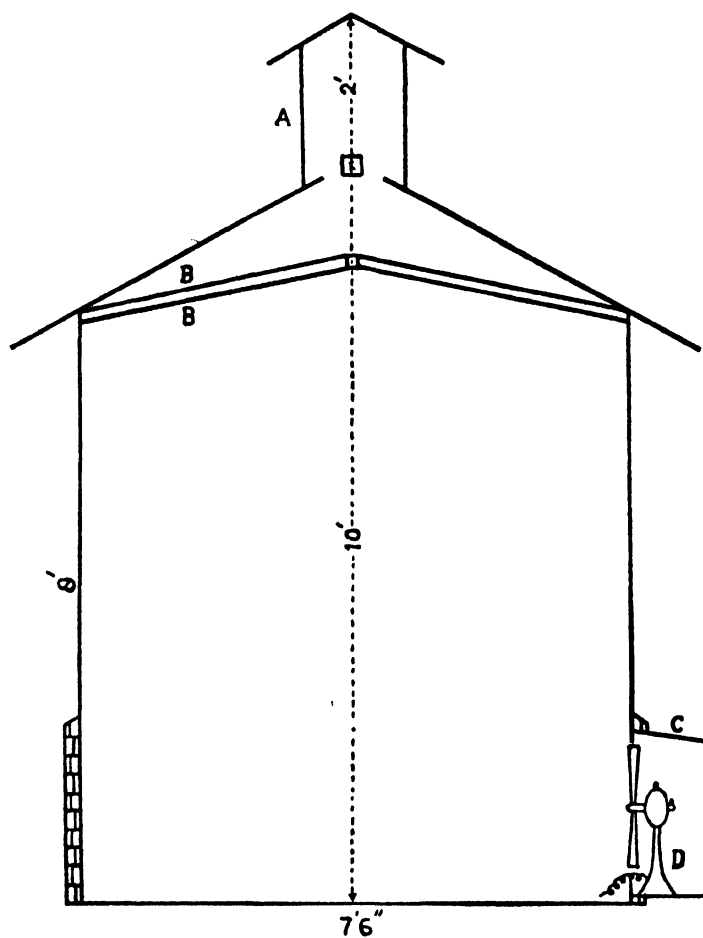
Section of Brown Rust greenhouse. A—Full-length chimney; B—Muslin ceiling, two layers; C—Khus box; D—Ventilating fan.
